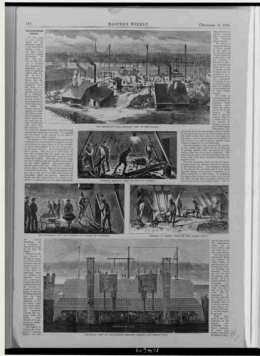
Falsework: the timber frame of the East River caisson, built in order to be destroyed or buried. Harper's Weekly, 1870.
